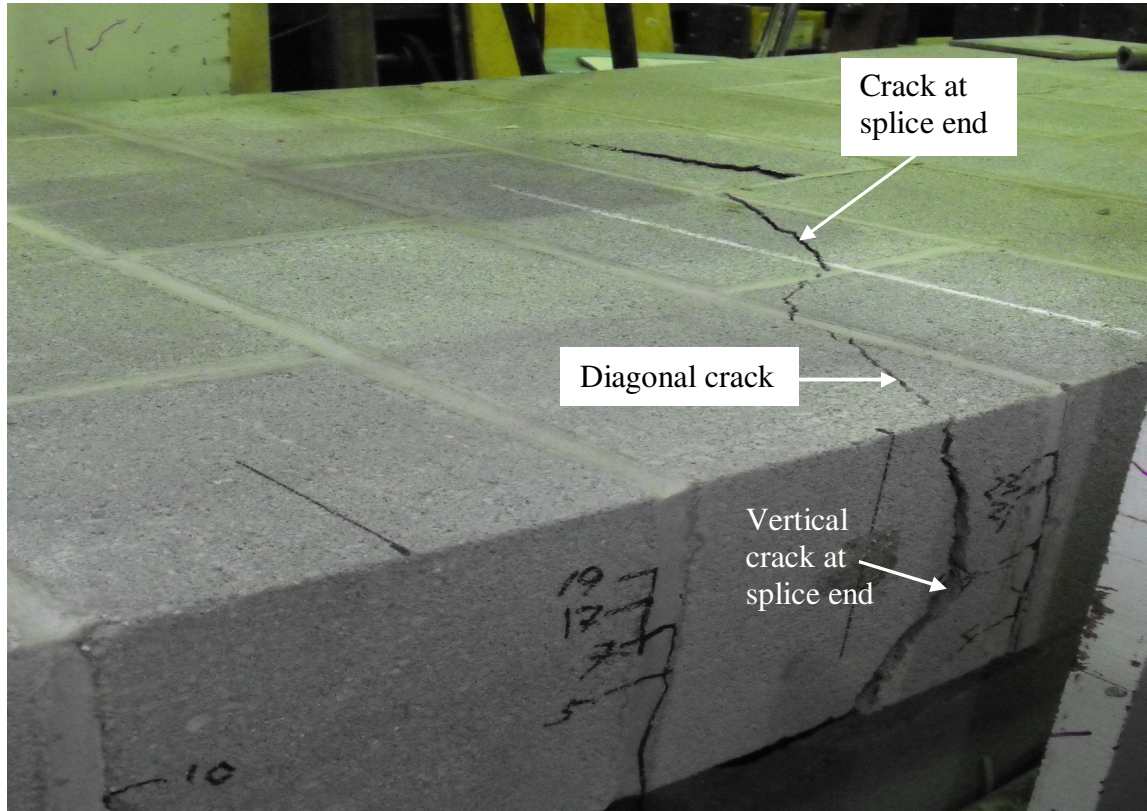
Typical cracking at failure for a wall splice specimen with non-contact lap splices - Specimen NCW-2.
